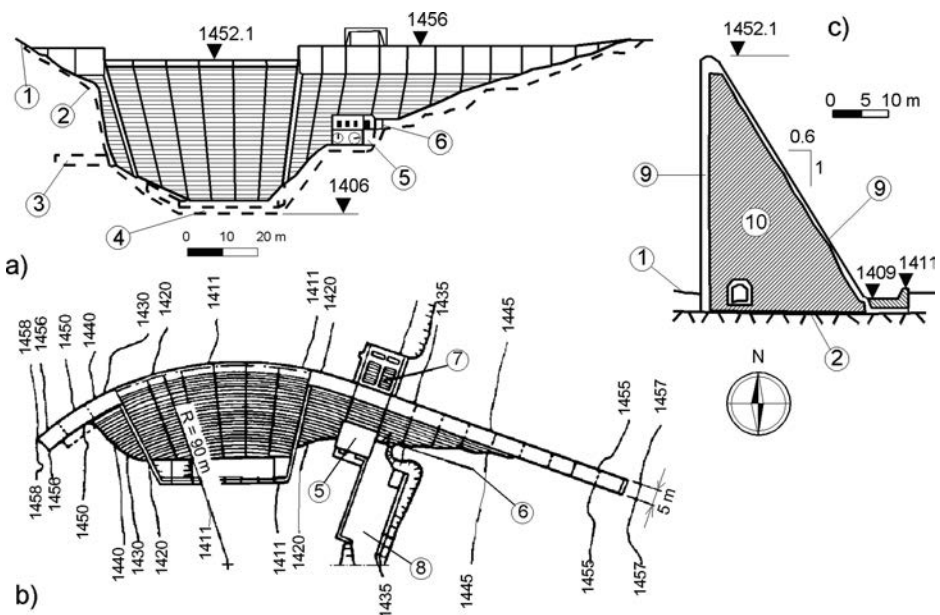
Layout plan and sections of Knellpoort dam. (1) Ground line; (2) bedrock line; (3) drainage tunnel; (4) concrete sill; (5) gate structure of the discharge outlet; (6) approach to the gallery; (7) intake tower for the discharge outlet; (8) parking lot; (9) surface layer of concrete.
